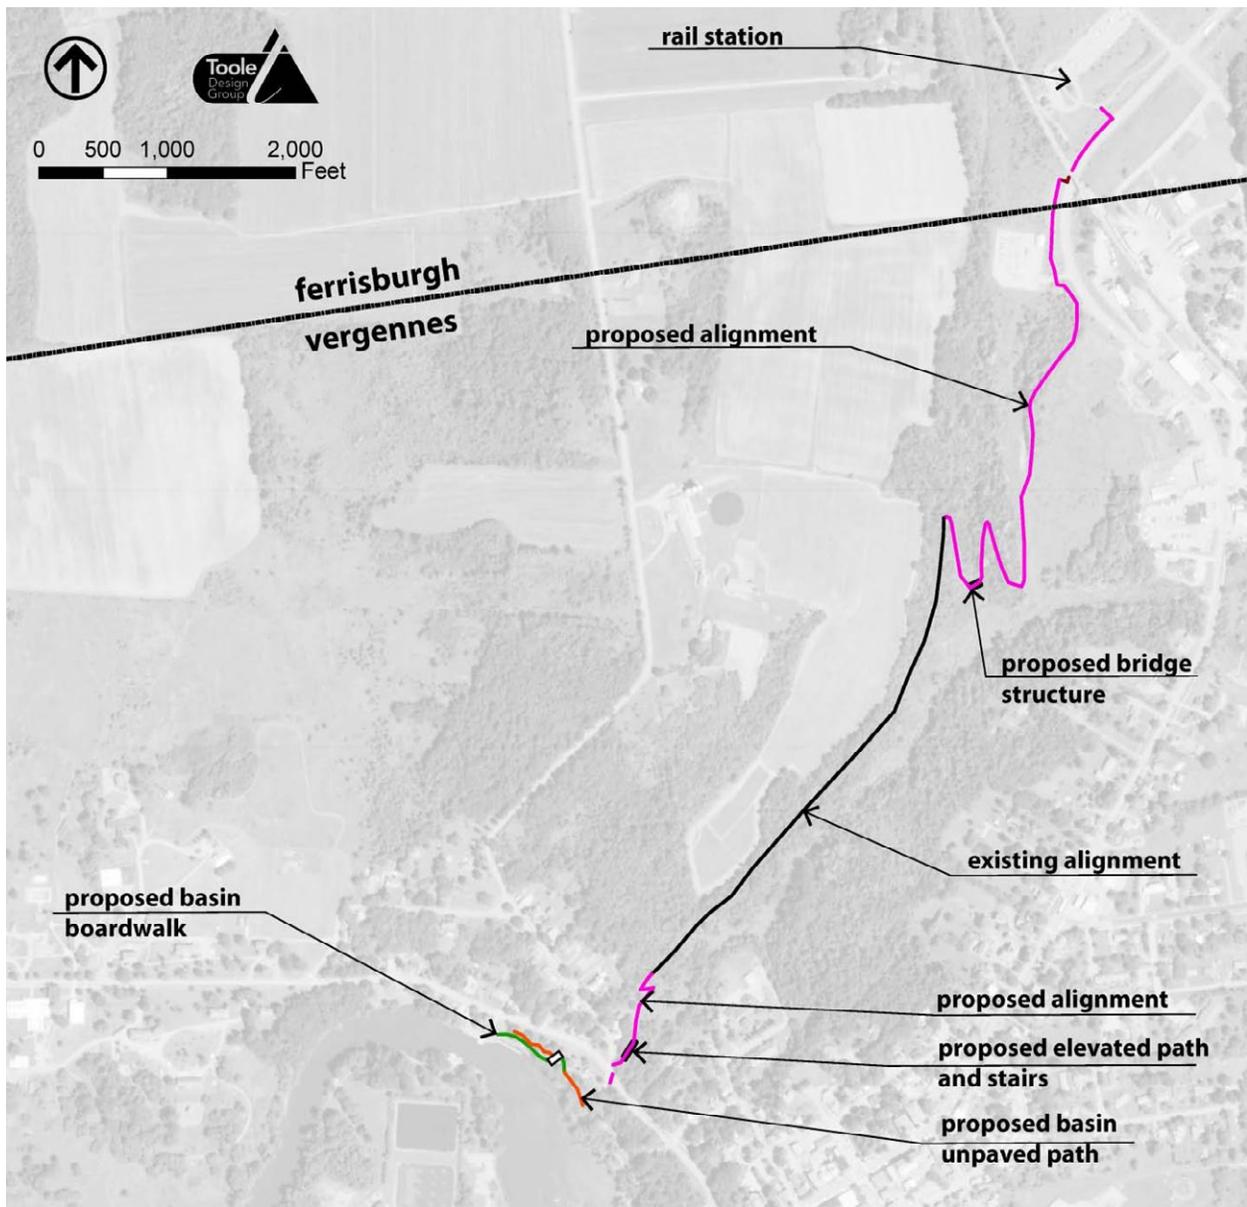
Potential bike trail alignment; concept provided by Timothy Cowan.
